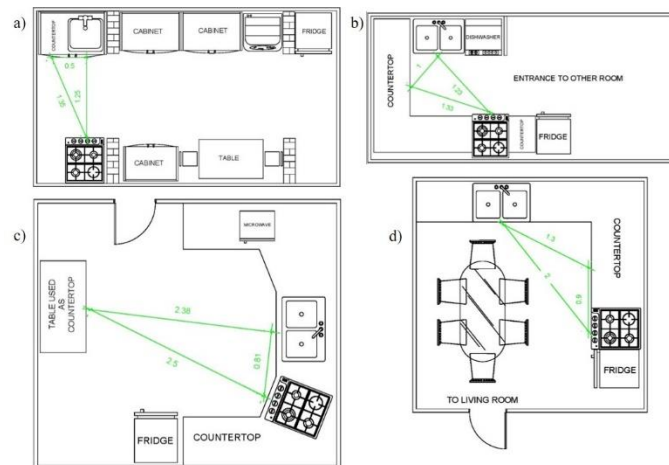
a) and b) Kitchen equipment arrangement where the food safety triangle has a perimeter ≤ 4 m and a sink – countertop distance ≤ 1 m (RO_Ionel_YSM and NO_Inger_EP); c) and d) Kitchen equipment arrangement where the food safety triangle has a perimeter >4 m and a sink – countertop distance >1 m (HU_BA_YF and FR_Elodie_YF)
